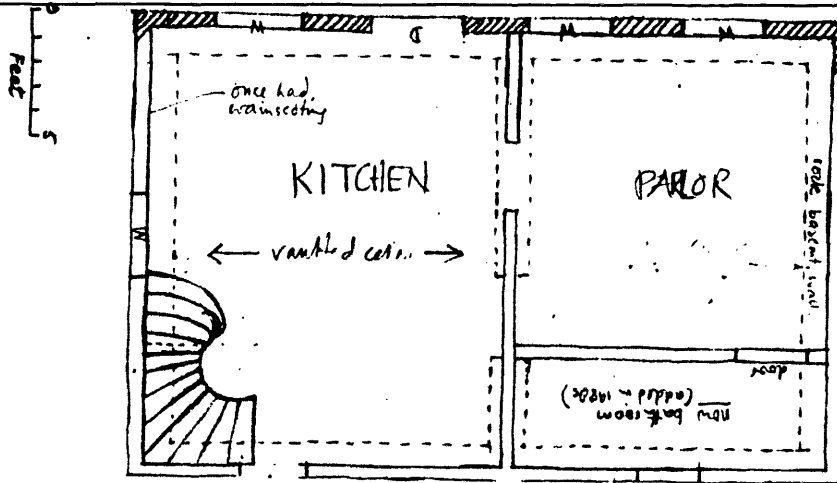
First Floor Plan. Ploessl House. St. Donatus, Iowa ( Site 16 )
